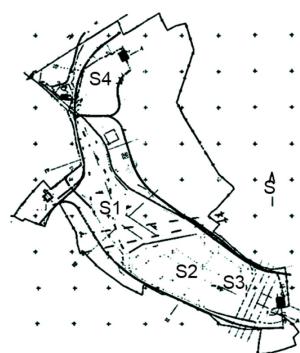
Layout plan of *Bubanj* landfill with sections S1, S2, S3, and S4
